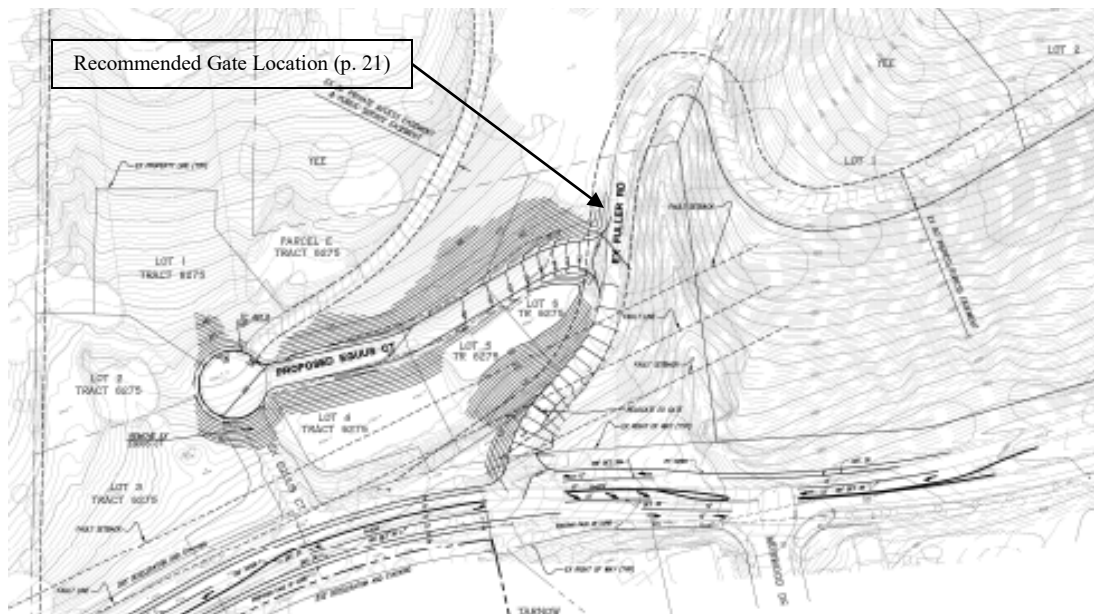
“*Preliminary Foothill Road/Equus Court Improvements*” plan.
